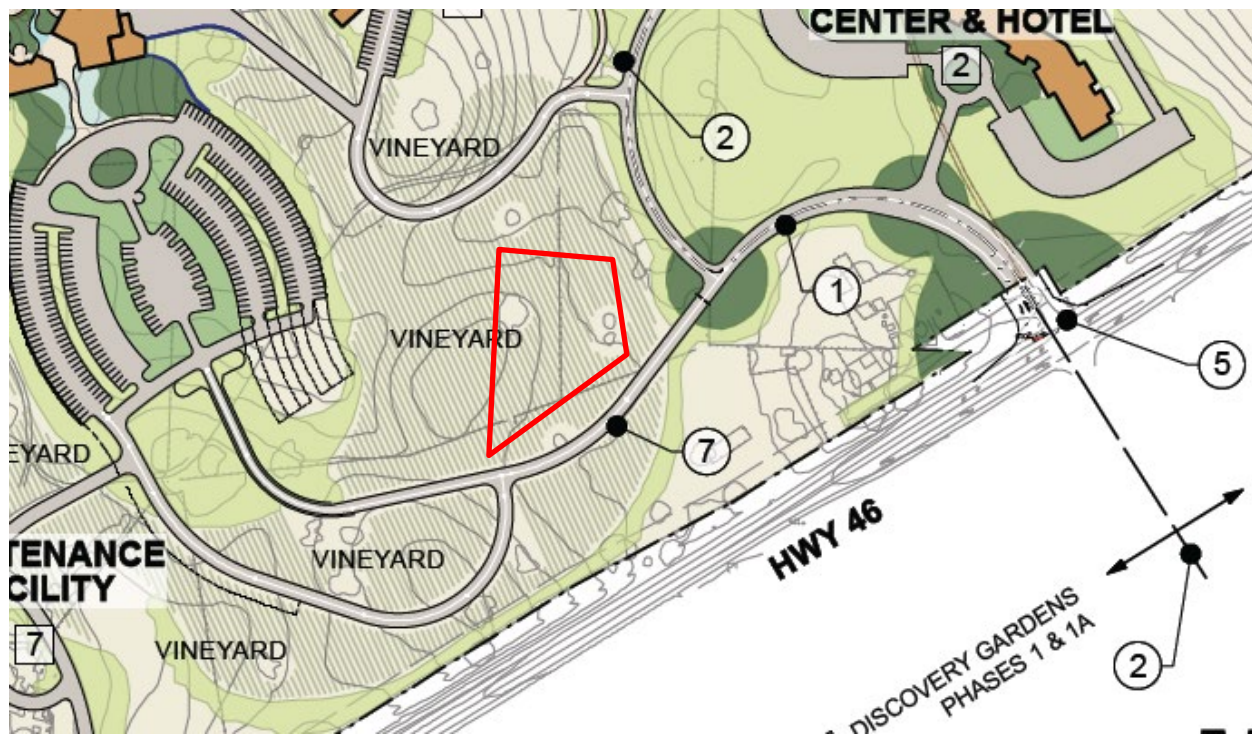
B: Proposed Project Area over Phase 1 Master Site Development Plan.
